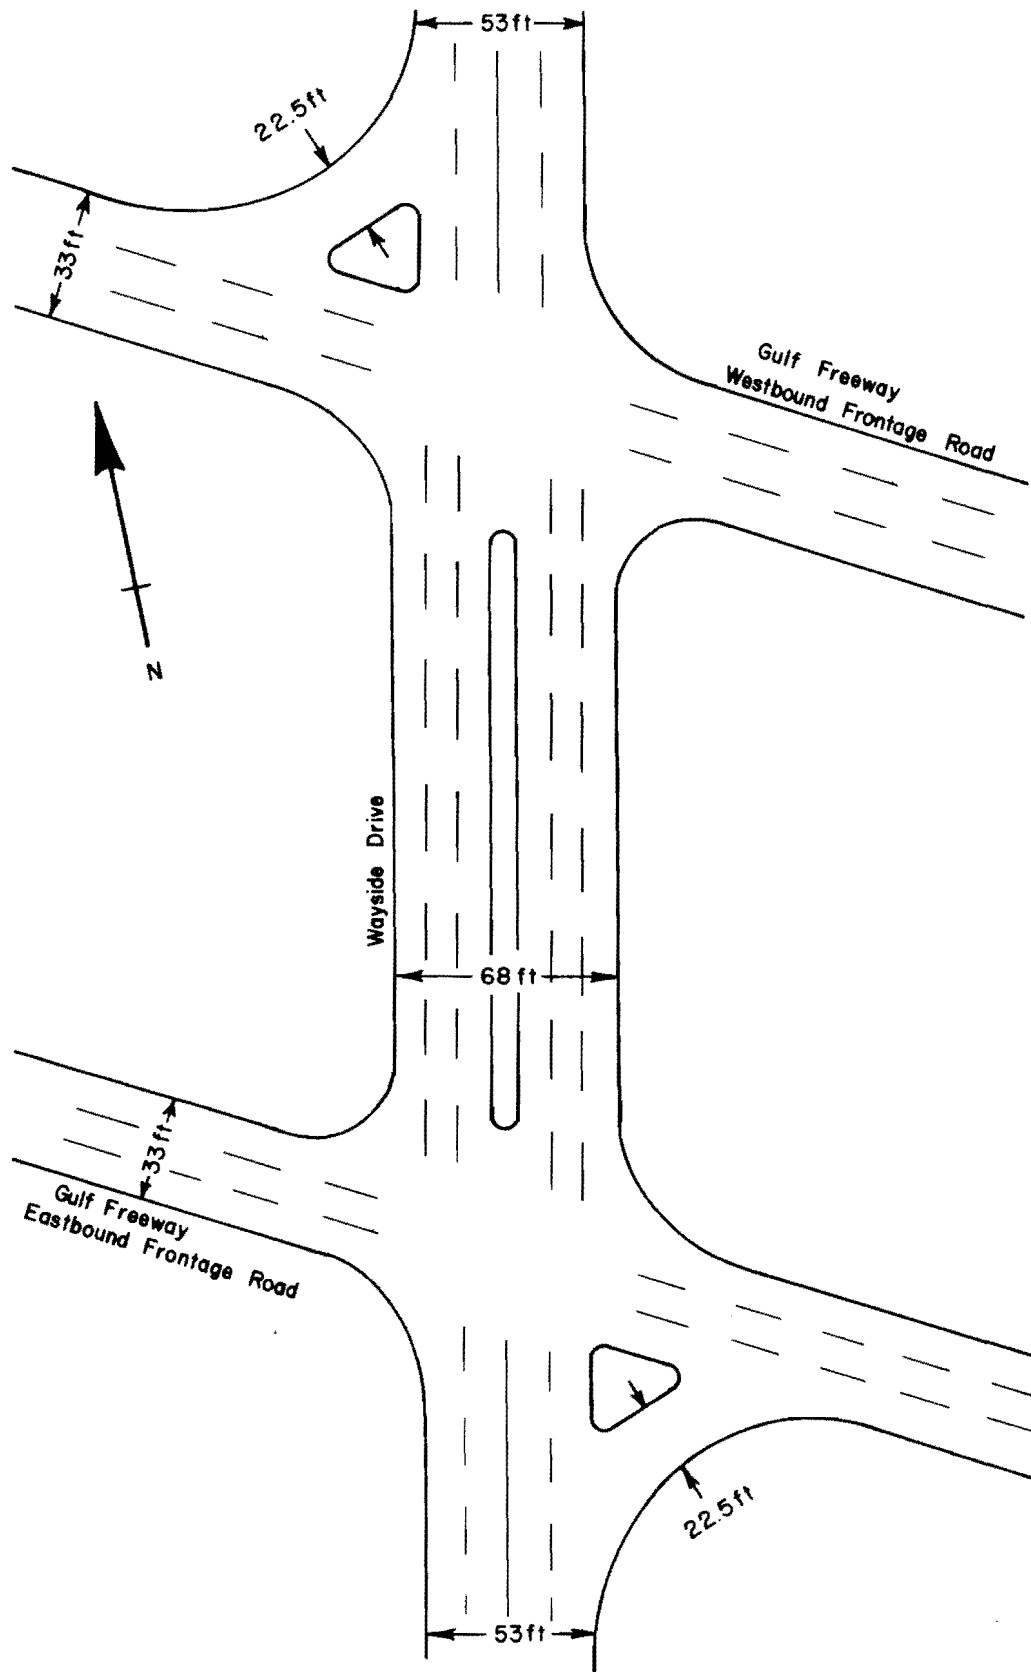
Layout of Gulf Freeway frontage roads and Wayside Drive intersection (before changes).
